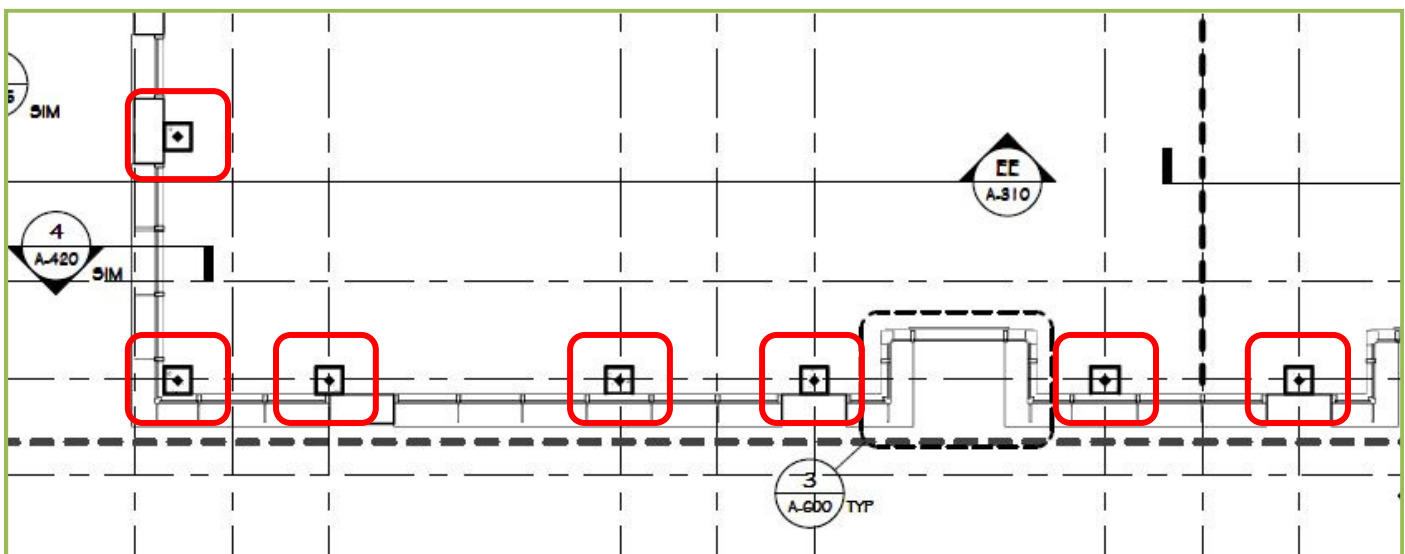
Slab Edge Columns – Courtesy of Clark Construction
